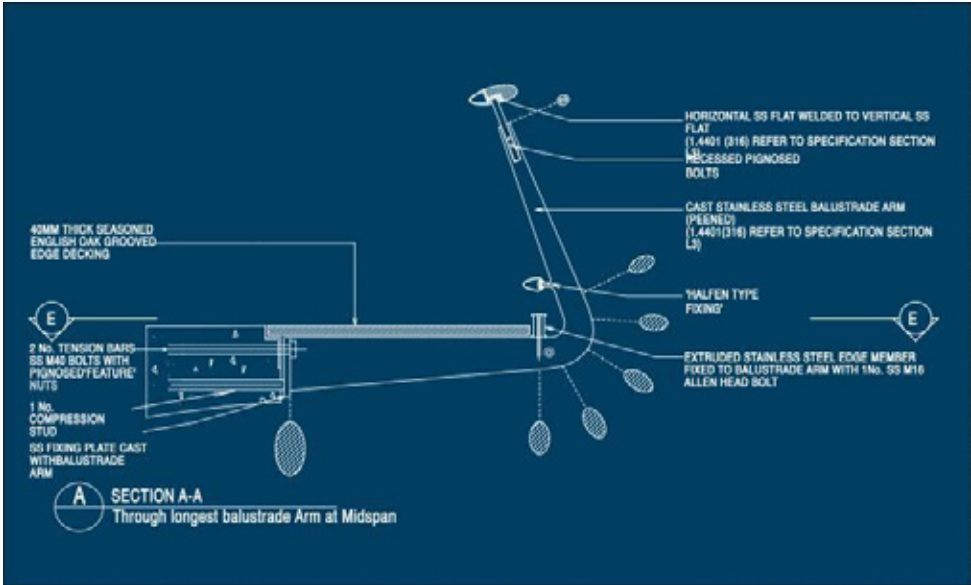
Michael Stacey Architects' working drawing of balustrade of Ballingdon Bridge, this safety system is a combination of stainless steel castings, stainless steel wires and two bespoke aluminium extrusions
